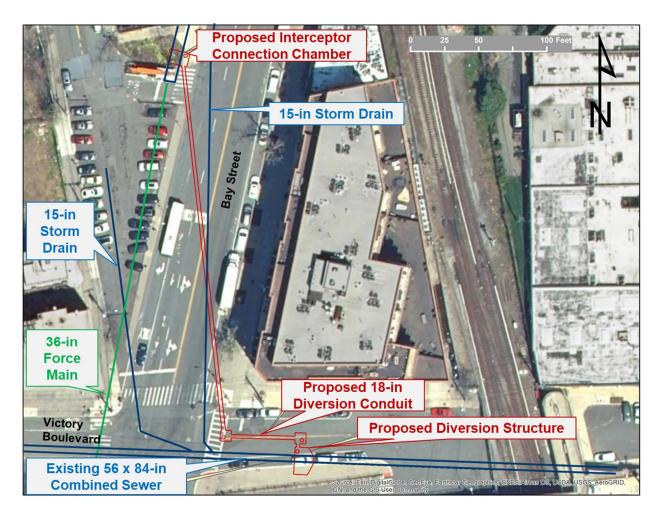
Conceptual Layout of Alternative NYB-2 - Hannah Street Pumping Station Bypass
